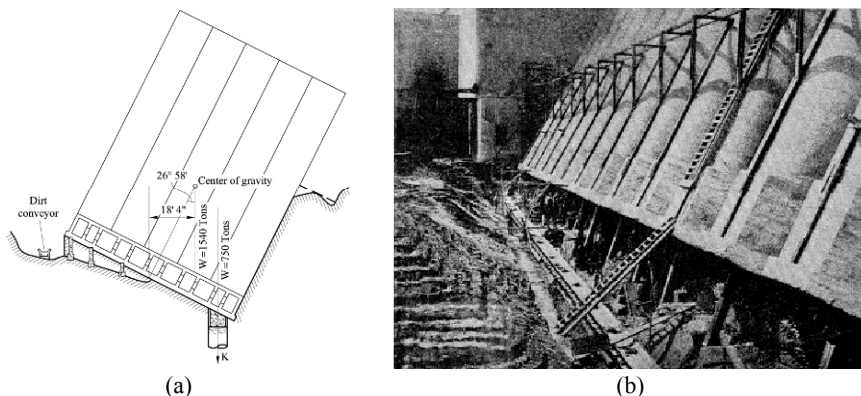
Under-excavation at the east (high) side (after Allaire, 1916): (a) a cross-section with the piers; (b) a view.
